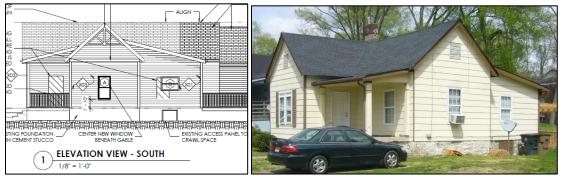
(left) shows the new window plan for the right facade and Figure 7 (right) show the existing window openings.
